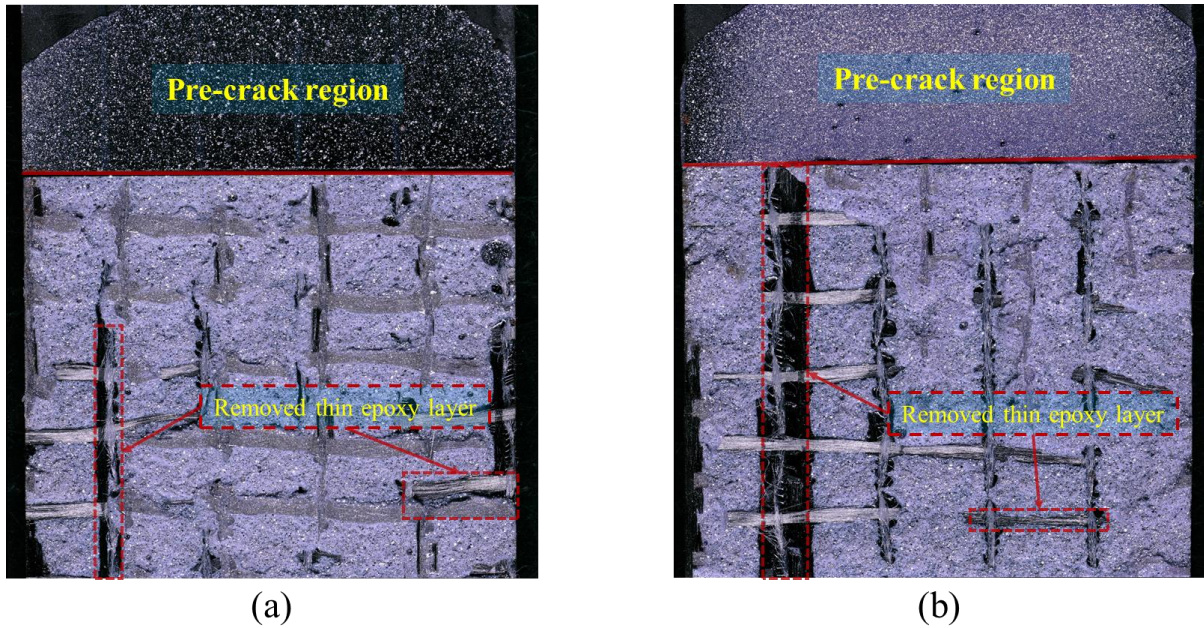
The fracture surfaces of the DCB specimens with different loading rates: (a) 5.0 mm/s and (b) 15.0 mm/s.
